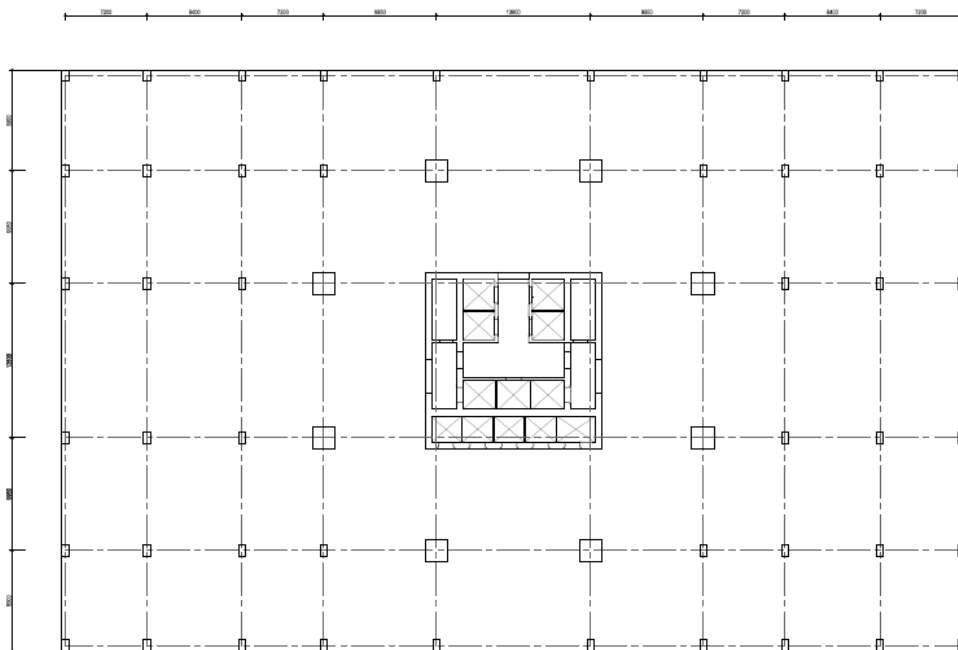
Layout of structural floor plan from Level 1-Level 8
